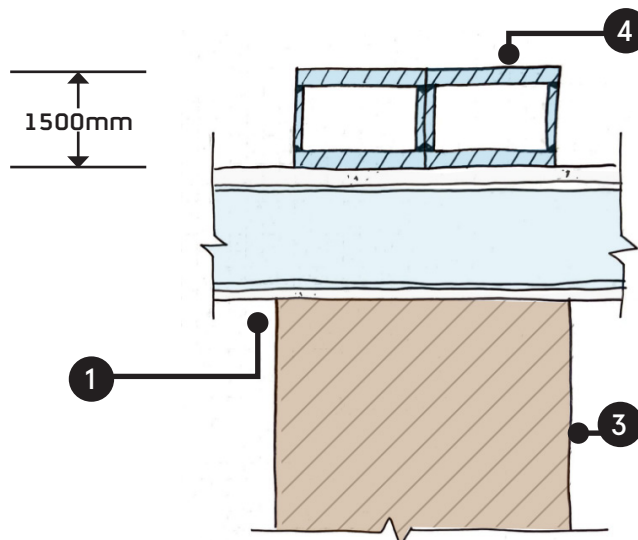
SECTIONS THROUGH PROPOSED SPREADER BEAM OPTION 2
